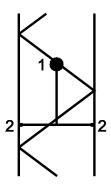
and C.2 show examples of mass modelling in cross aisle direction using substructures.
